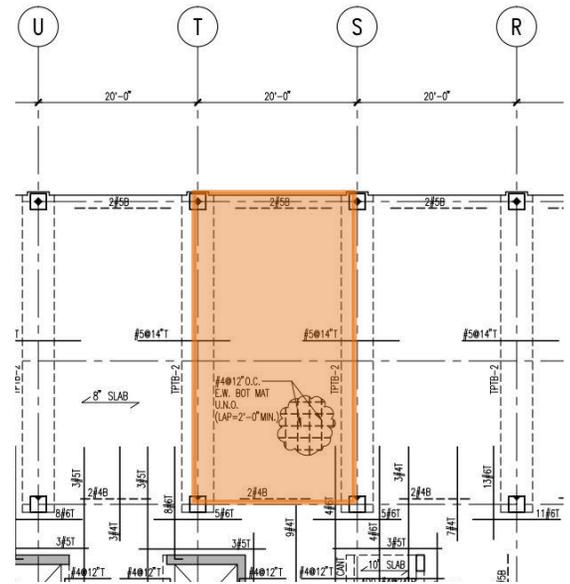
Plan of Office Bay – by Cagley and Assoc.
